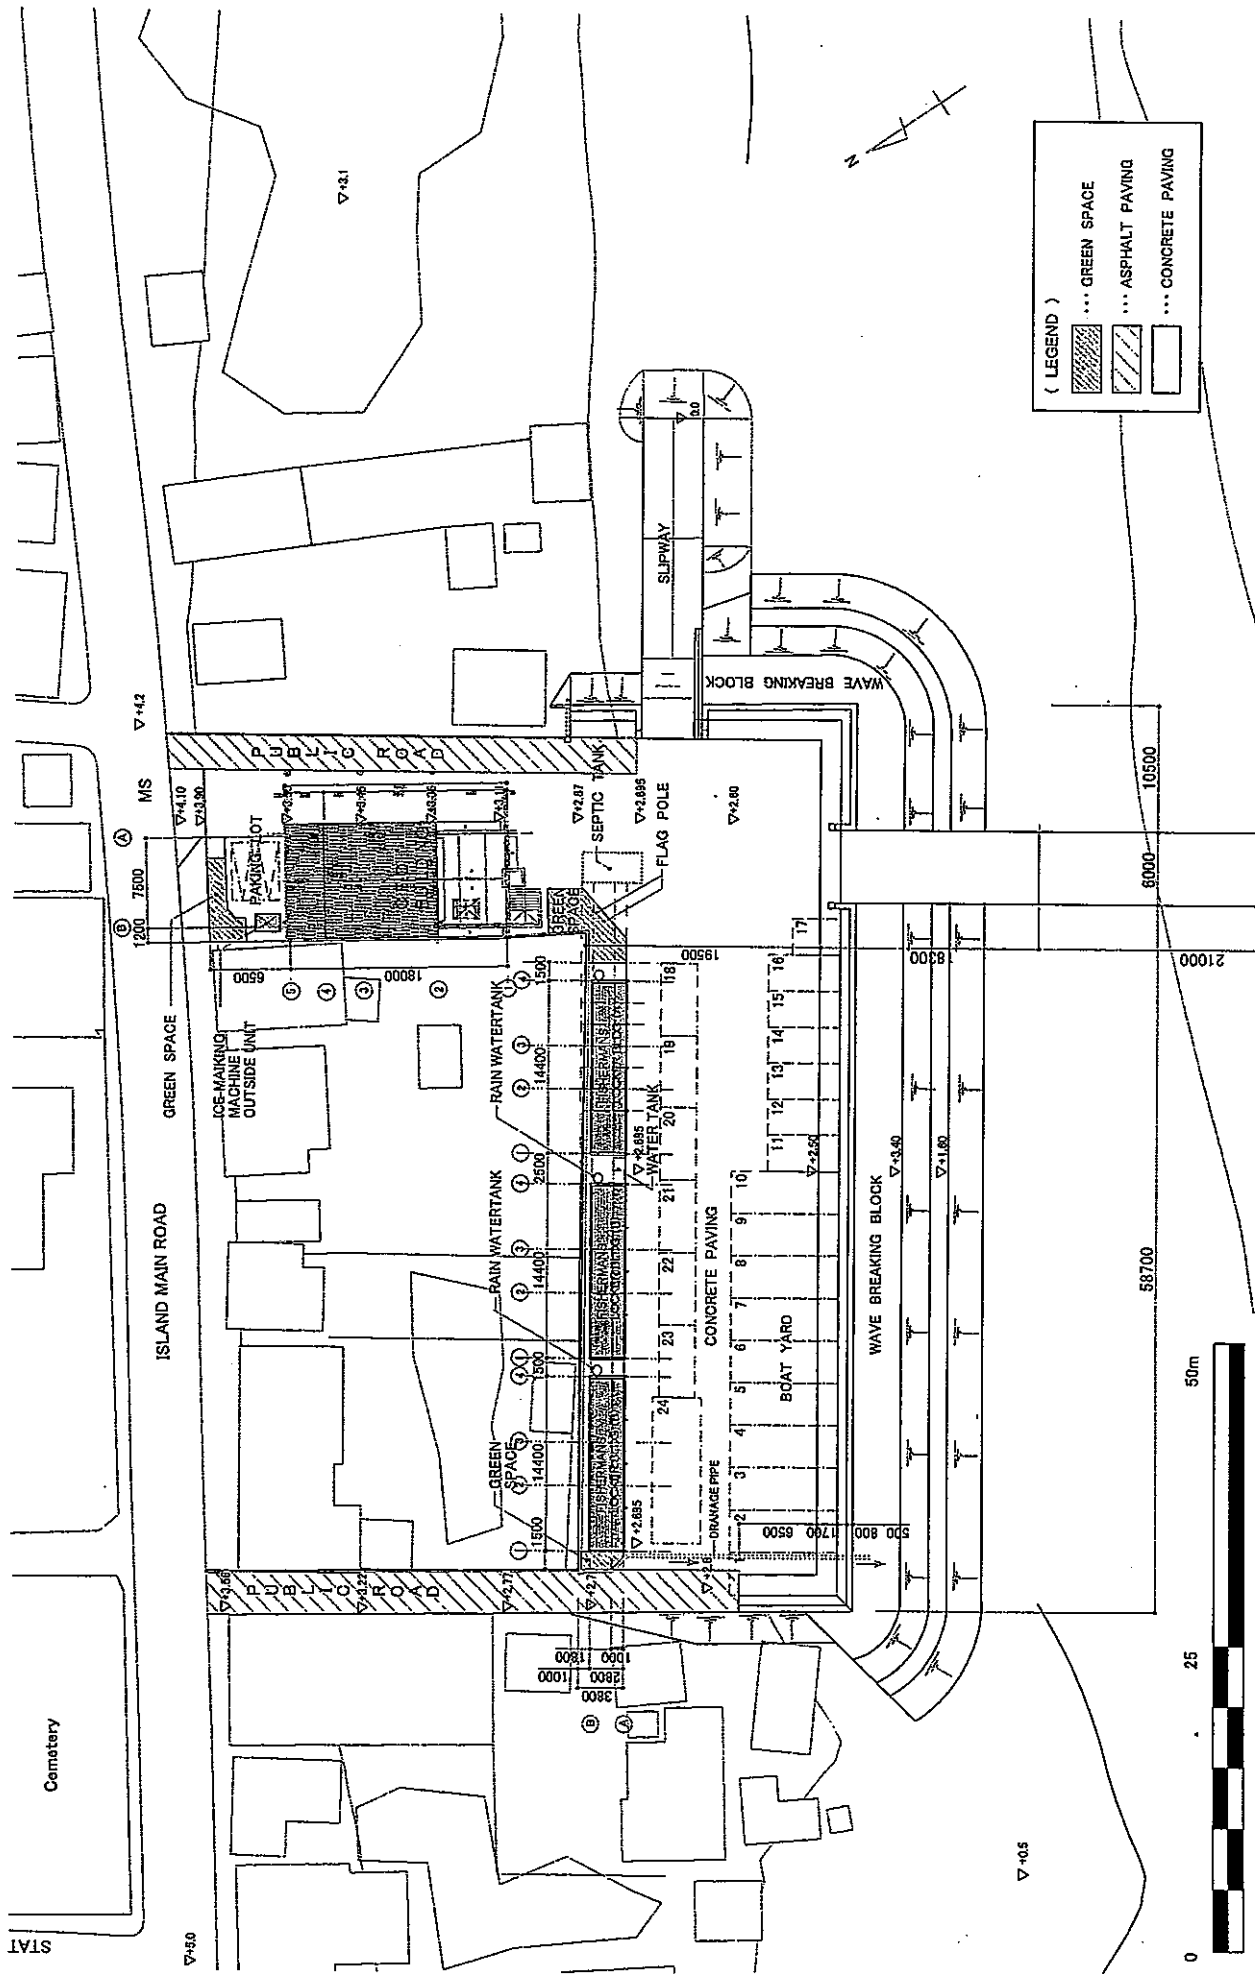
General Layout of Old Road Community Fishery Centre Building and Fishermen's Lockers
